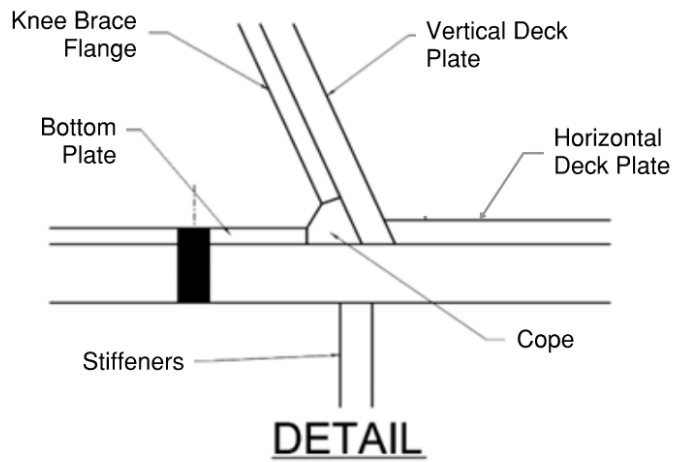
(b) – Knee Brace & Floorbeam Connection Detail
